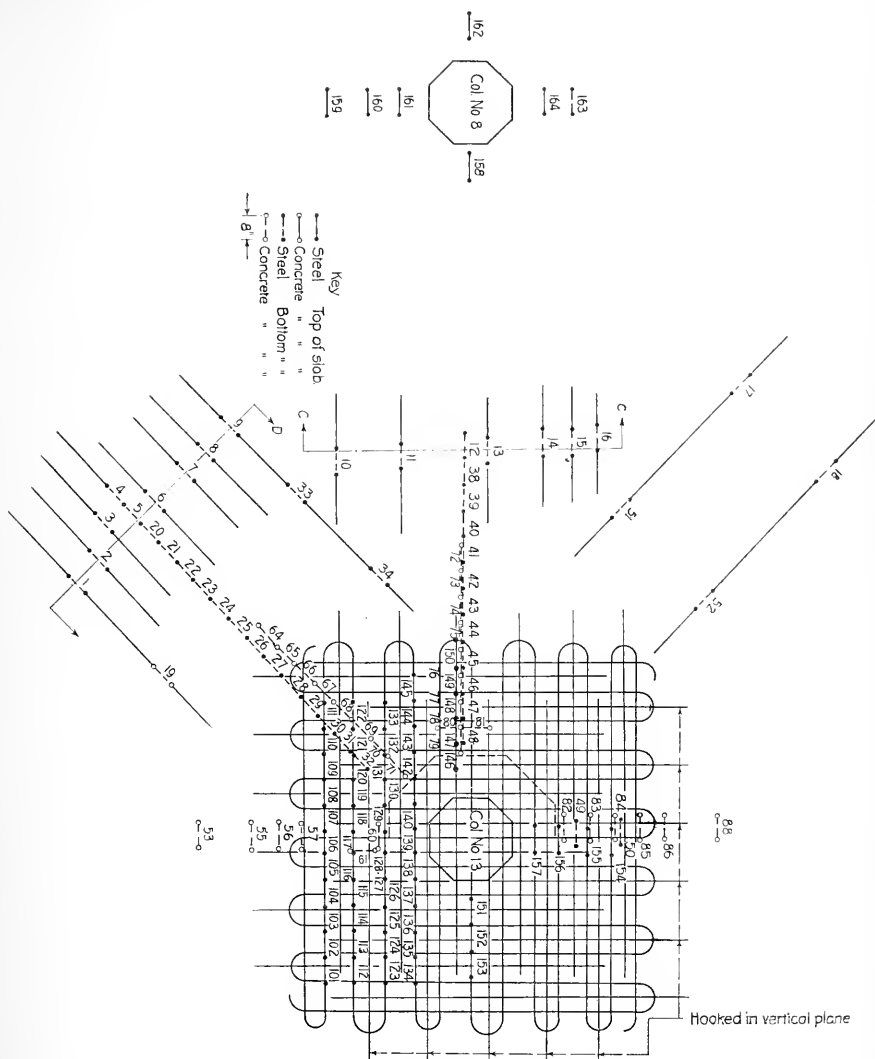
LOCATION OF GAGE LINES ON UPPER AND UNDER SURFACES OF TEST FLOOR CURTIS-LEGER COMPANY BUILDING.
